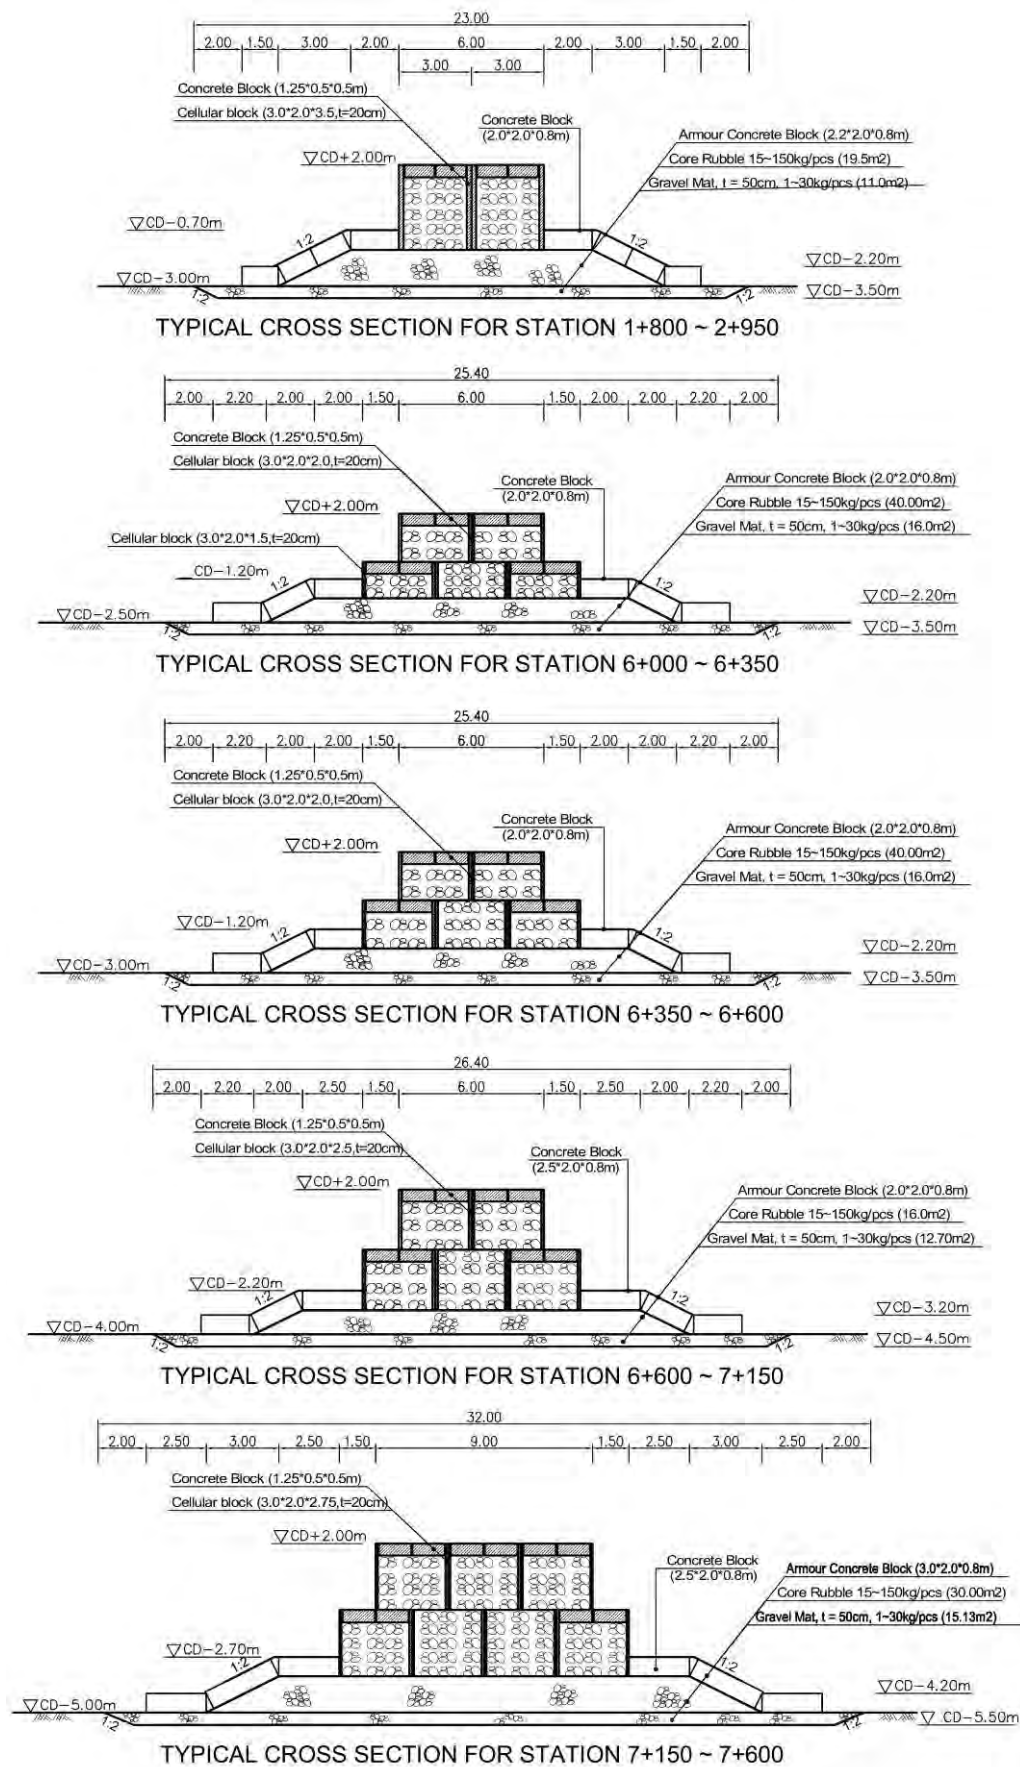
Typical Cross Sections of Sand Protection Dyke for Each Water Depth
